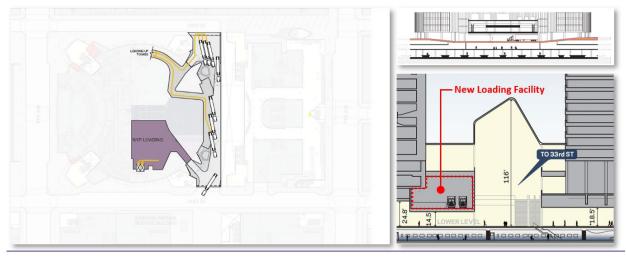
Proposed Concept MSG Below-Grade Loading Facility
